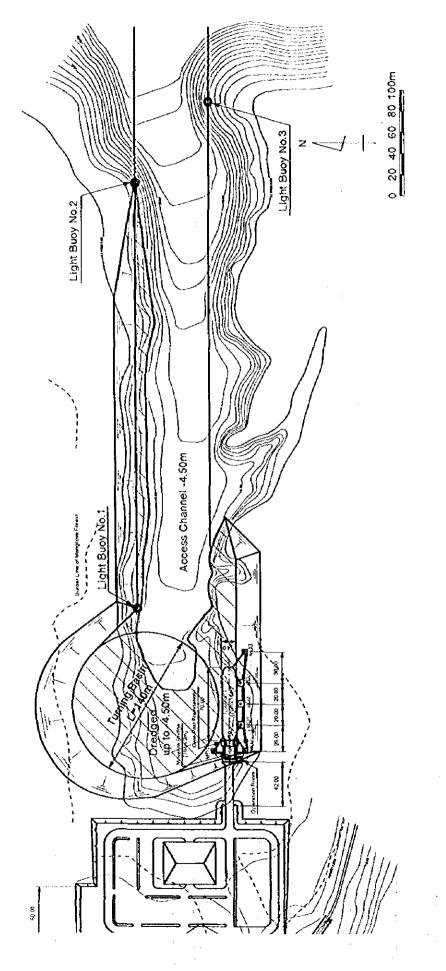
(2) General Plan of Access Channel and Basin for Selayar Ferry Terminal
